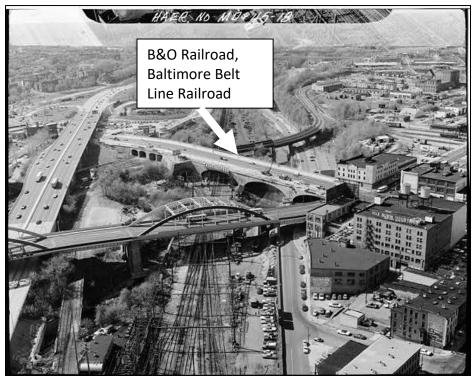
1977 aerial photograph (view looking northwest) by Jack Boucher showing the B&O Railroad, Baltimore Belt Line, Historic American Engineering Record photo #MD-45-18, "Northeast (Railroad) Corridor Amtrak Route between District of Columbia / Maryland State line and Maryland / Delaware State line."
